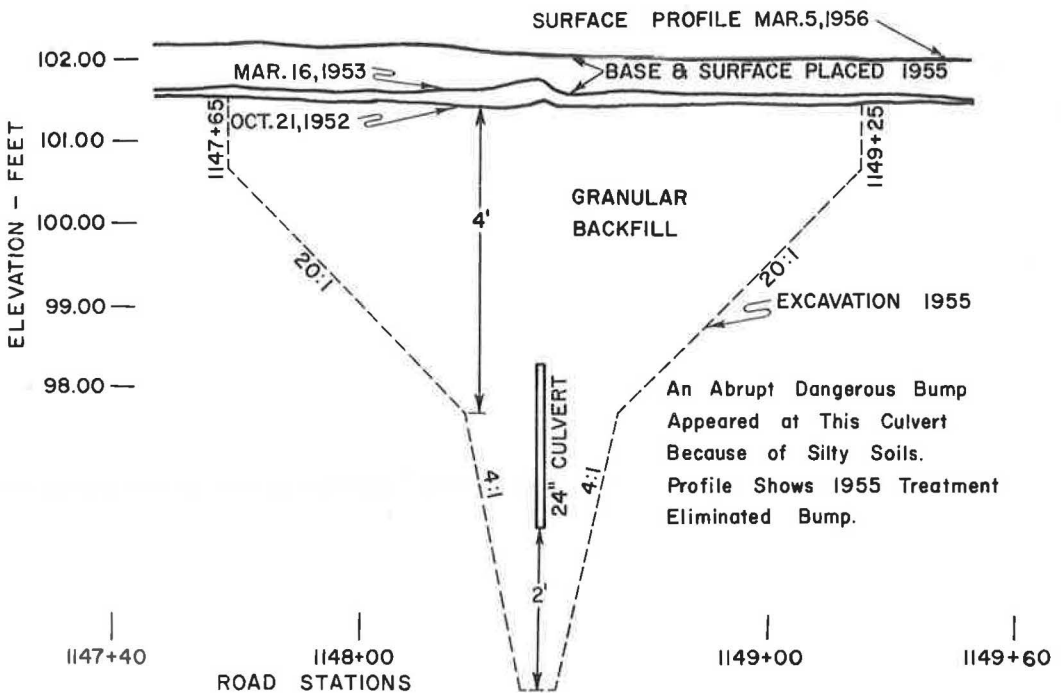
Typical culvert heave treatment--longitudinal section (Minn.).
